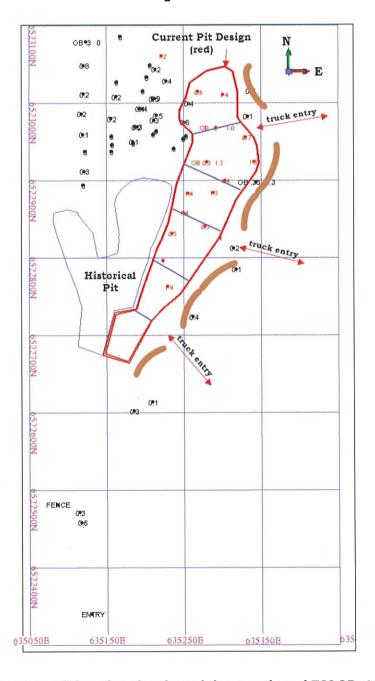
Mining plan showing mining panels and TS&OB stockpiles
